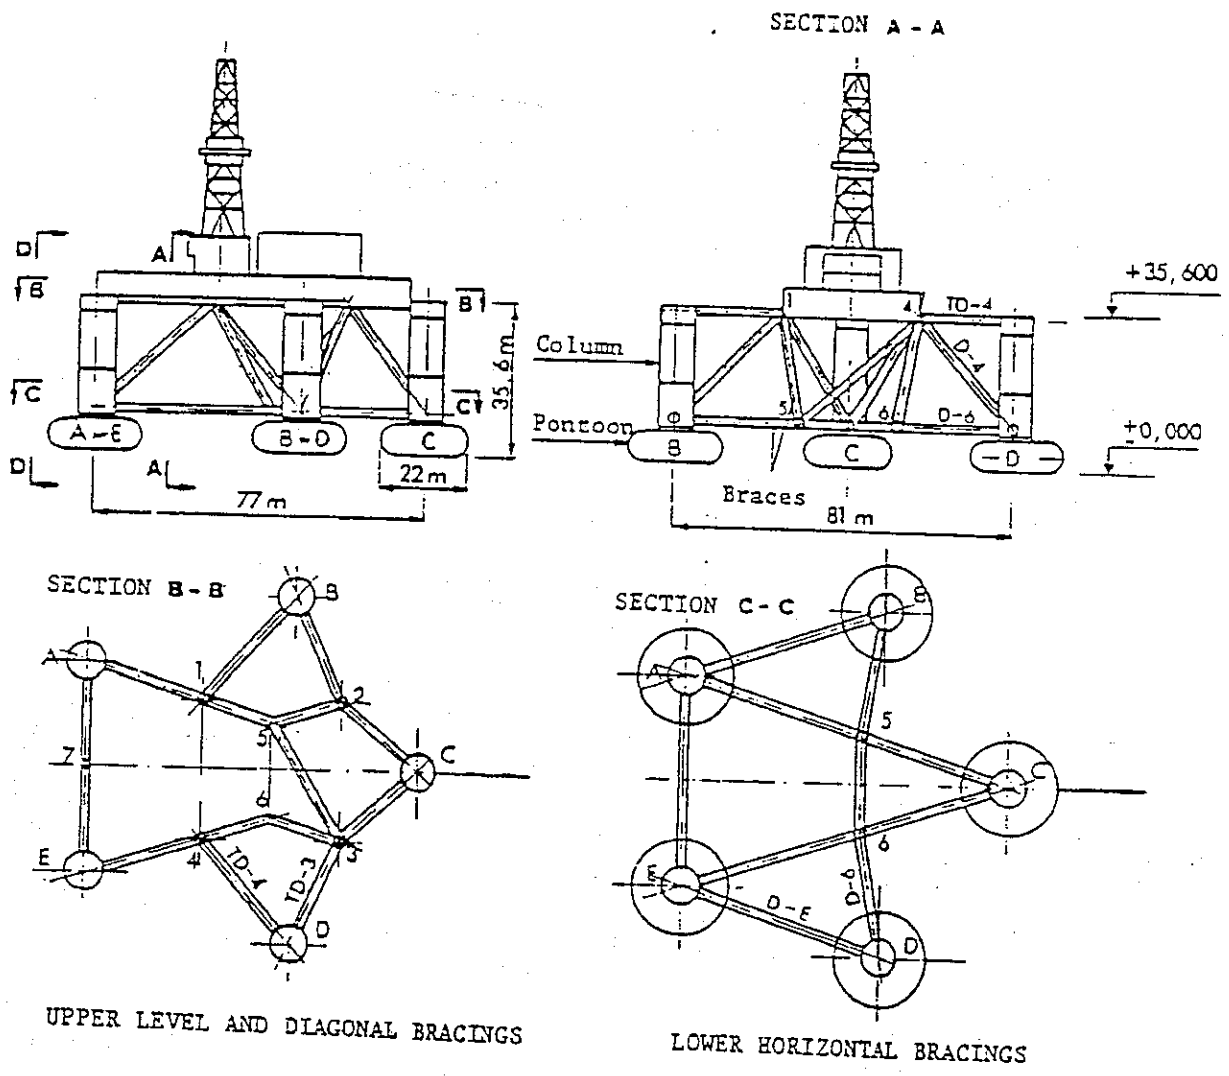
Structural arrangement of the Alexander L. Kielland platform
